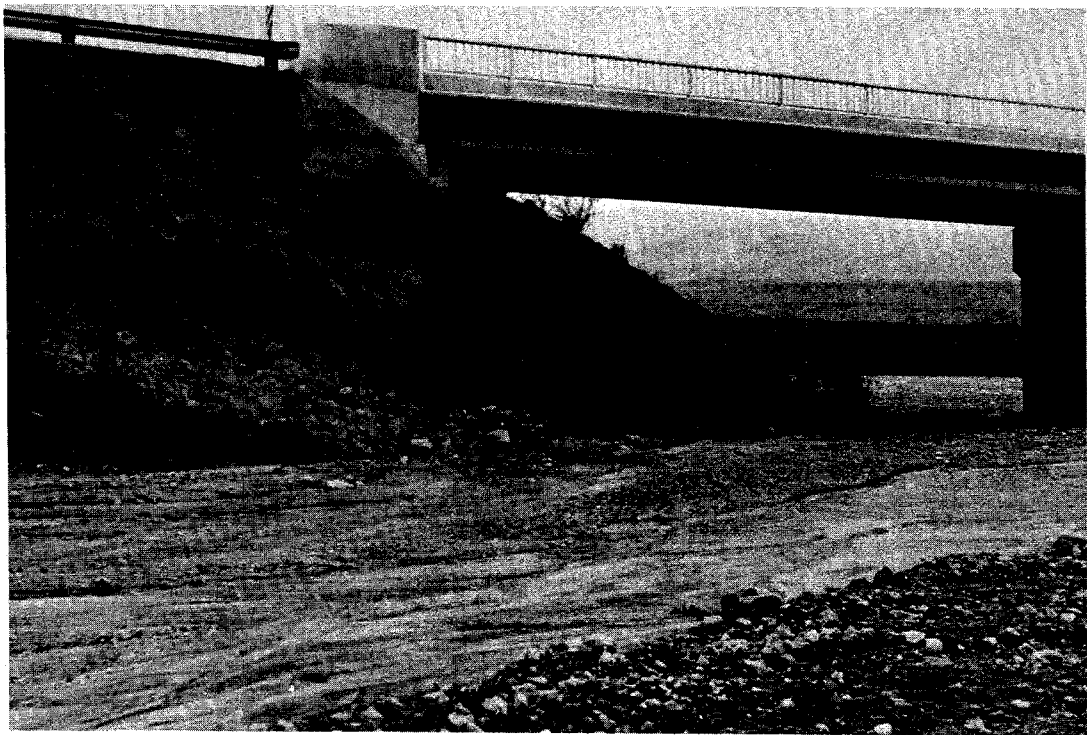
View of eroded left bank abutment after the 1971 flood. (From Arizona Dept. of Highways.)
